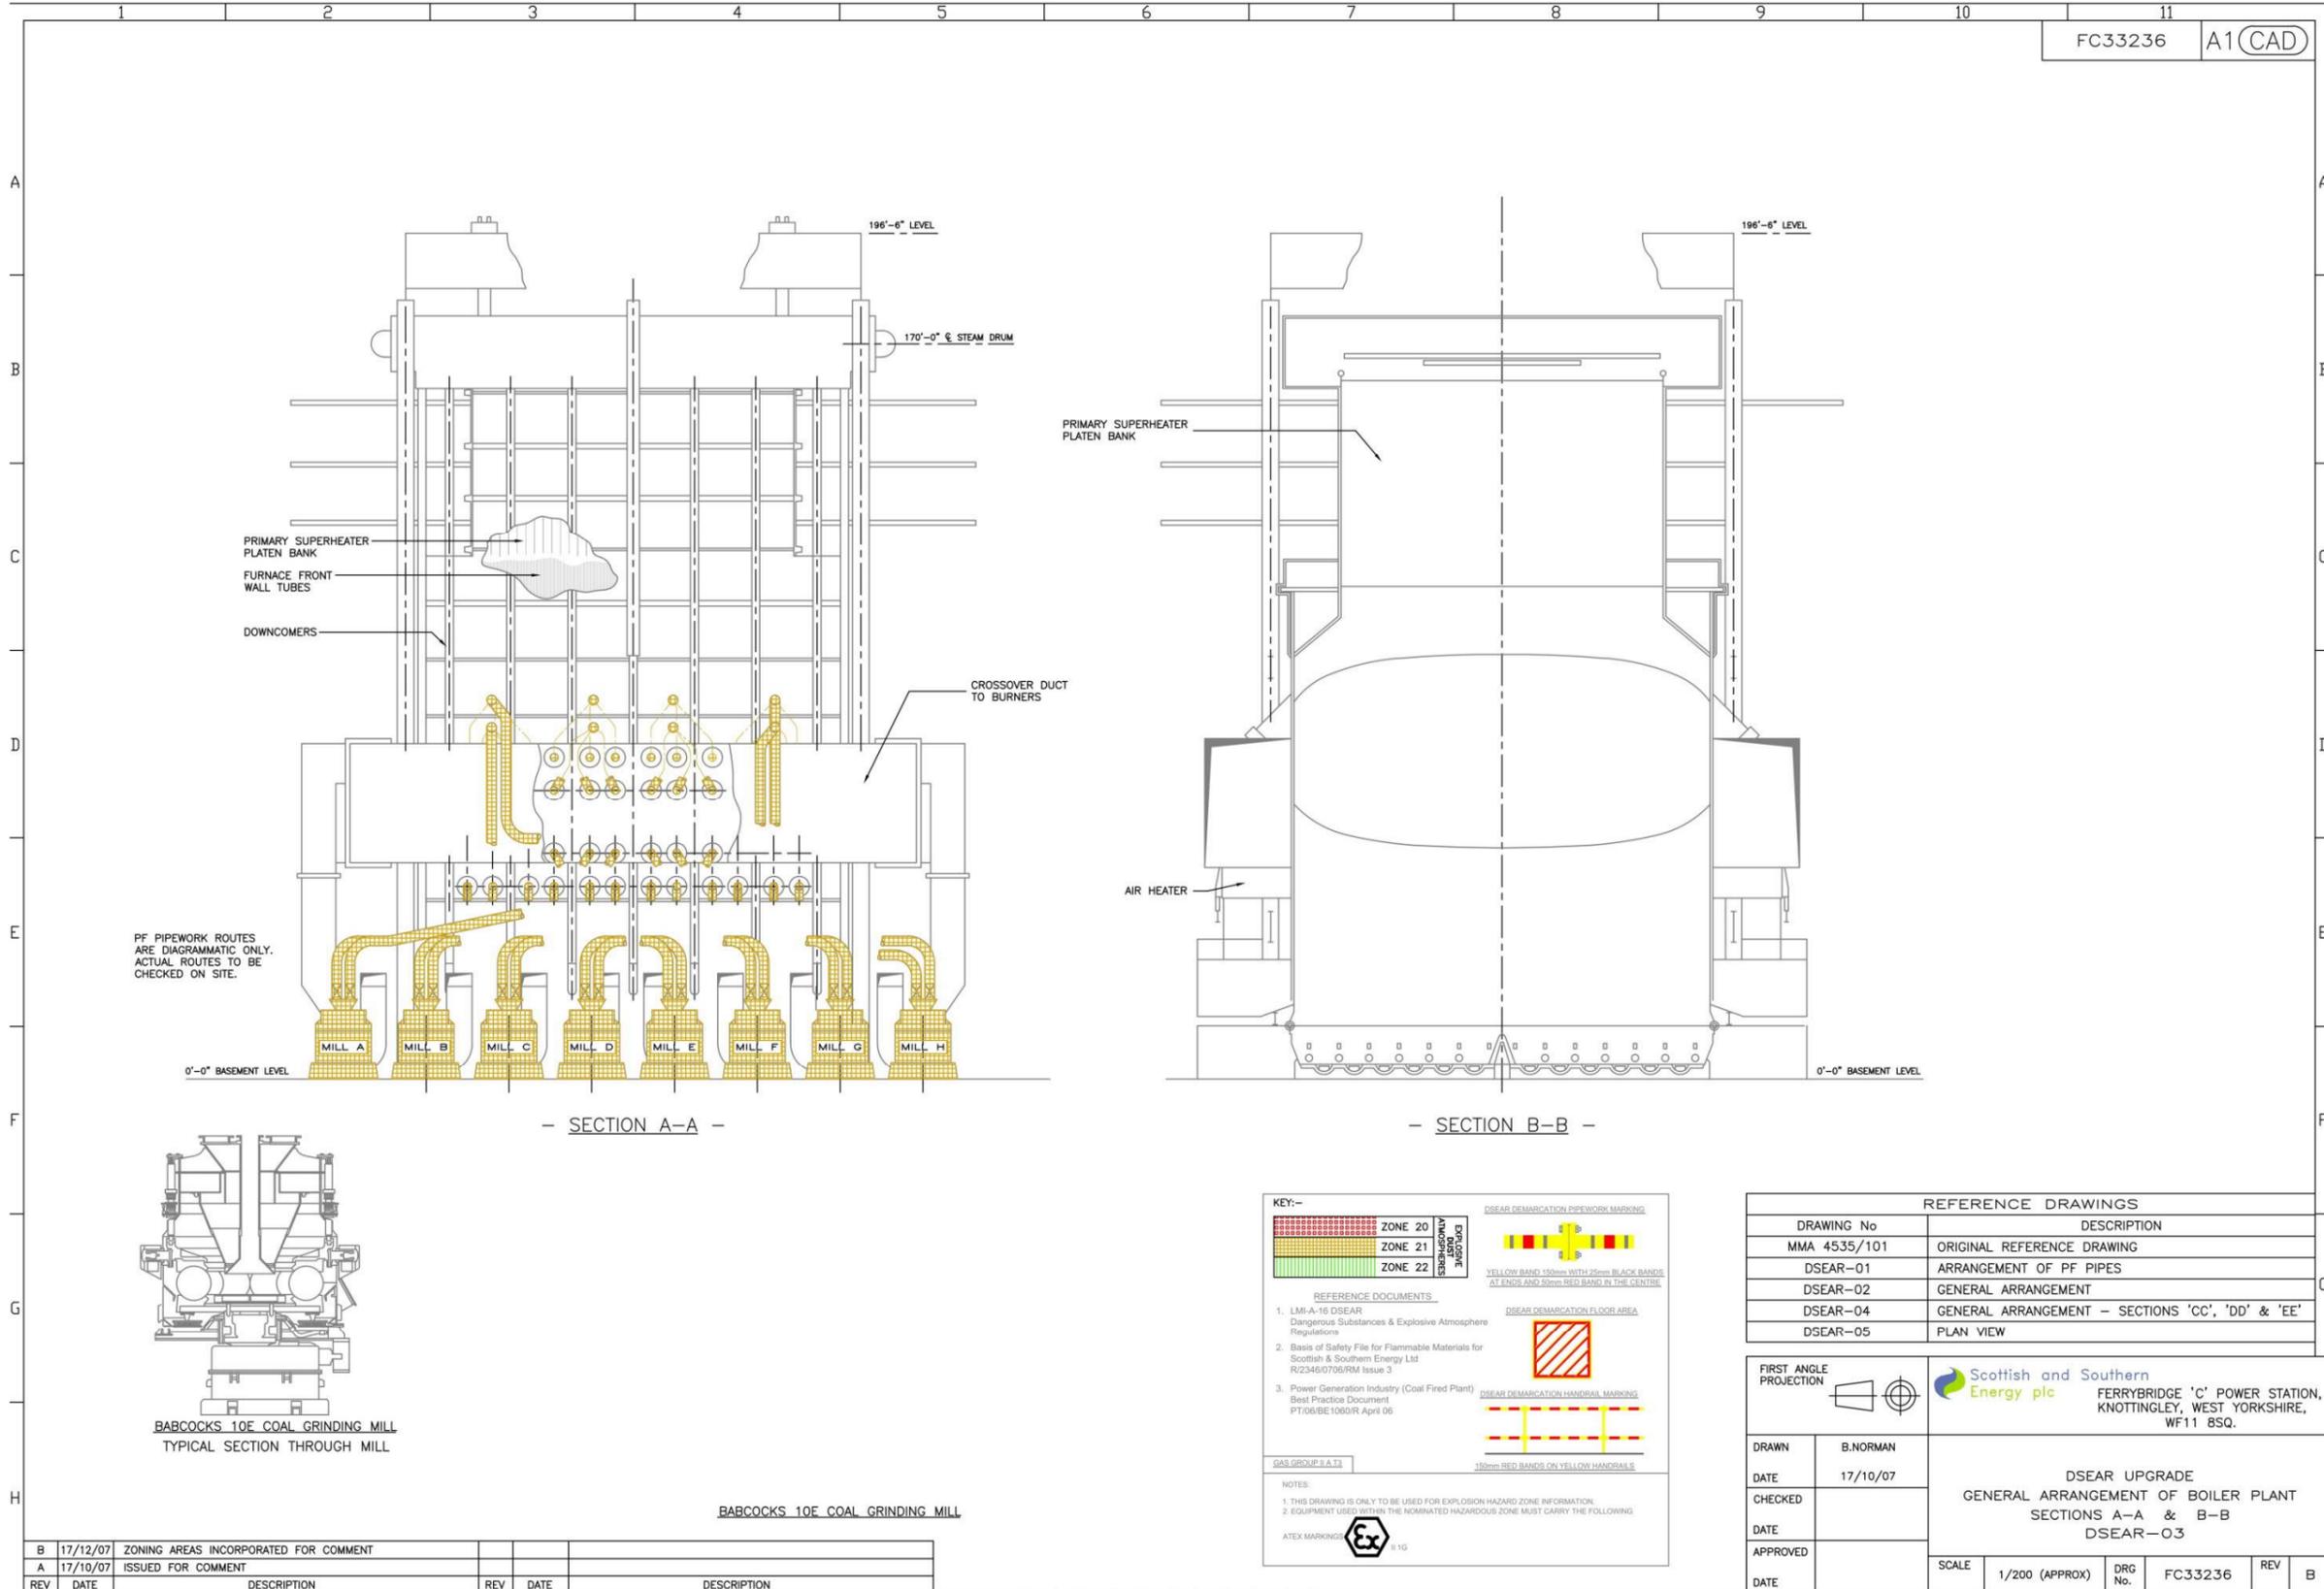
Plan view of an indicative section of the Coal Mills, Boiler, Precipitators and Chimney, also showing a section through a Coal Mill.
